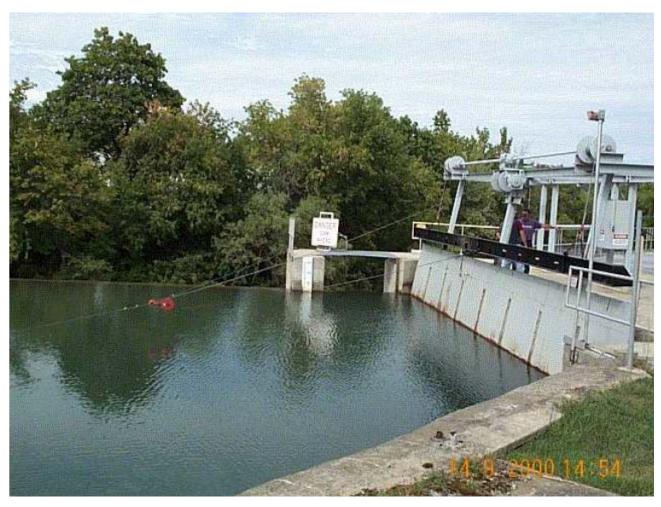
Intake structure the Lower LaChute Mill D Dam
